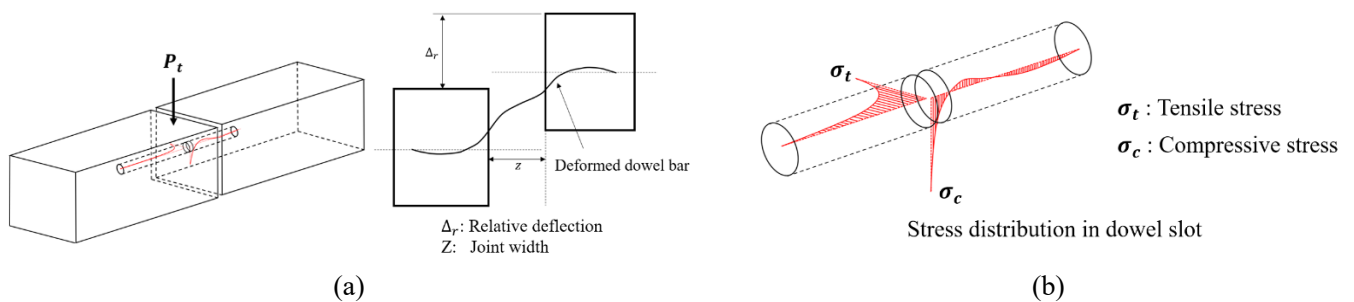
The load transfer in jointed plain concrete pavement system (a) load transfer mechanism, (b) stress distribution within the dowel slot.
